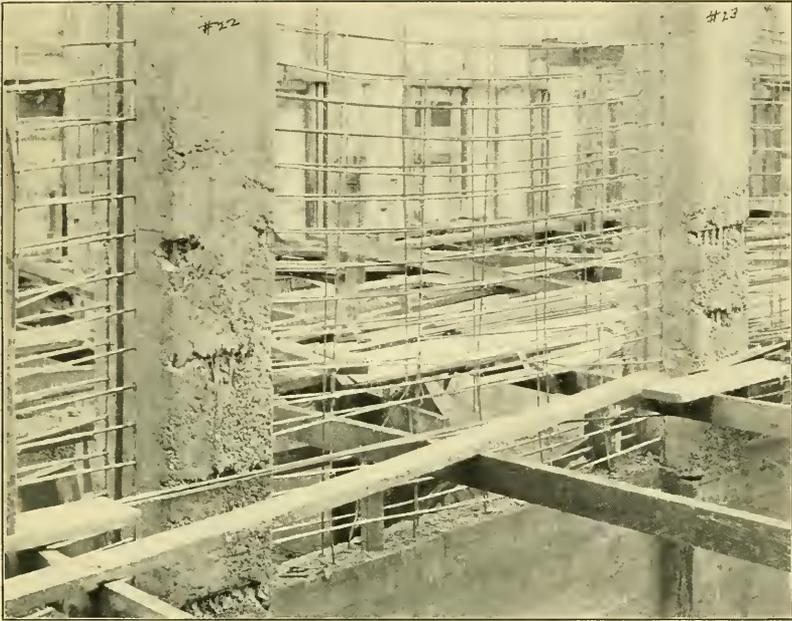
REINFORCEMENT OF WALLS AND COLUMNS.
